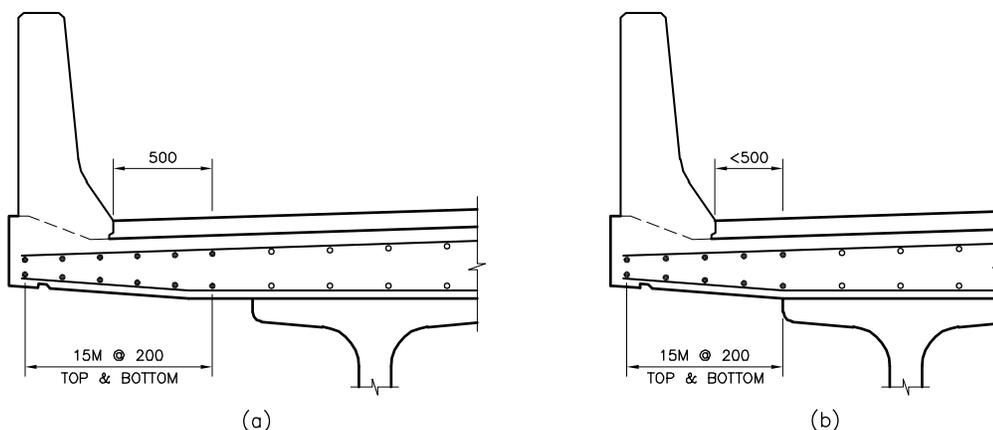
Longitudinal Reinforcement Below Barrier Wall
